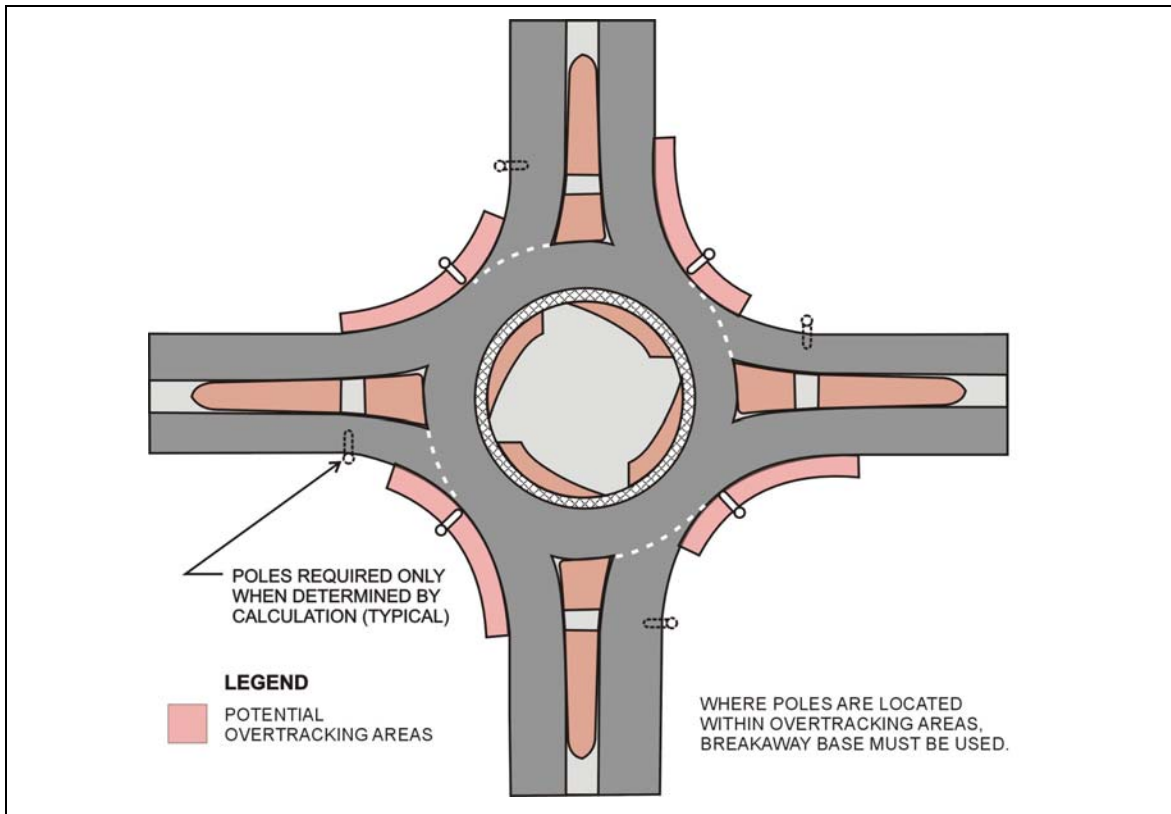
Example of partial lighting for a roundabout on unlighted Roadways
